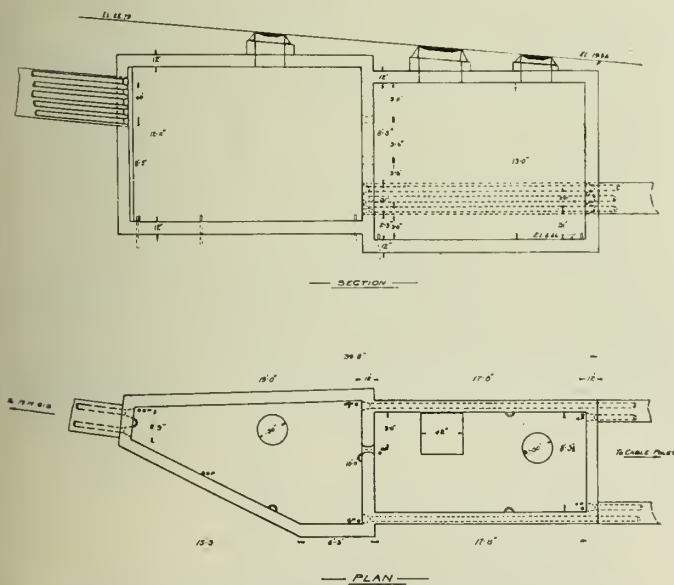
66-kv. Manholes at End of Duct Line Connecting with Overhead System.
